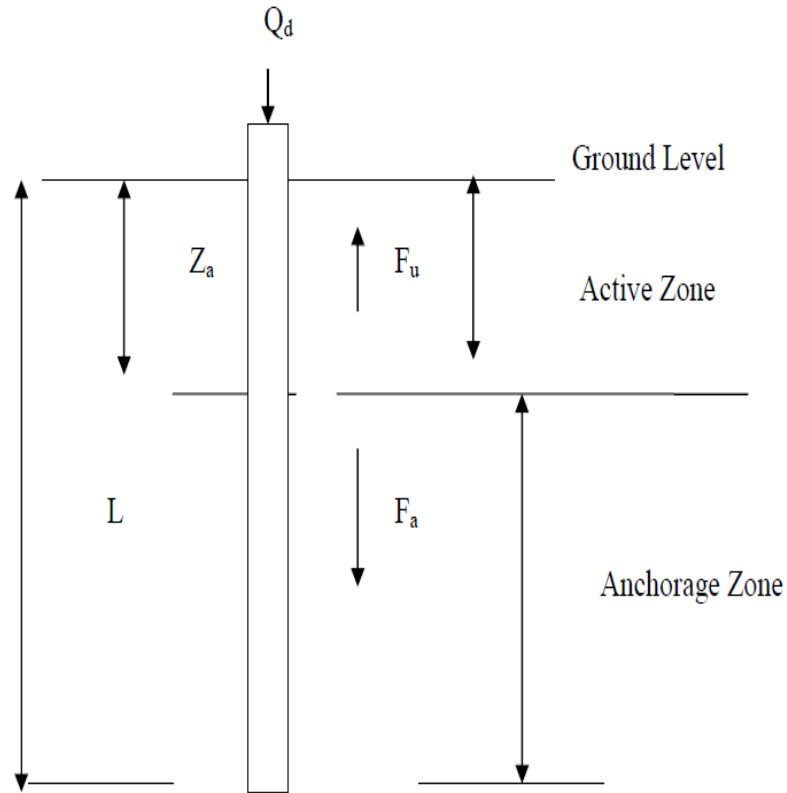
Forces acting on a pile in expansive soils ^[14]
